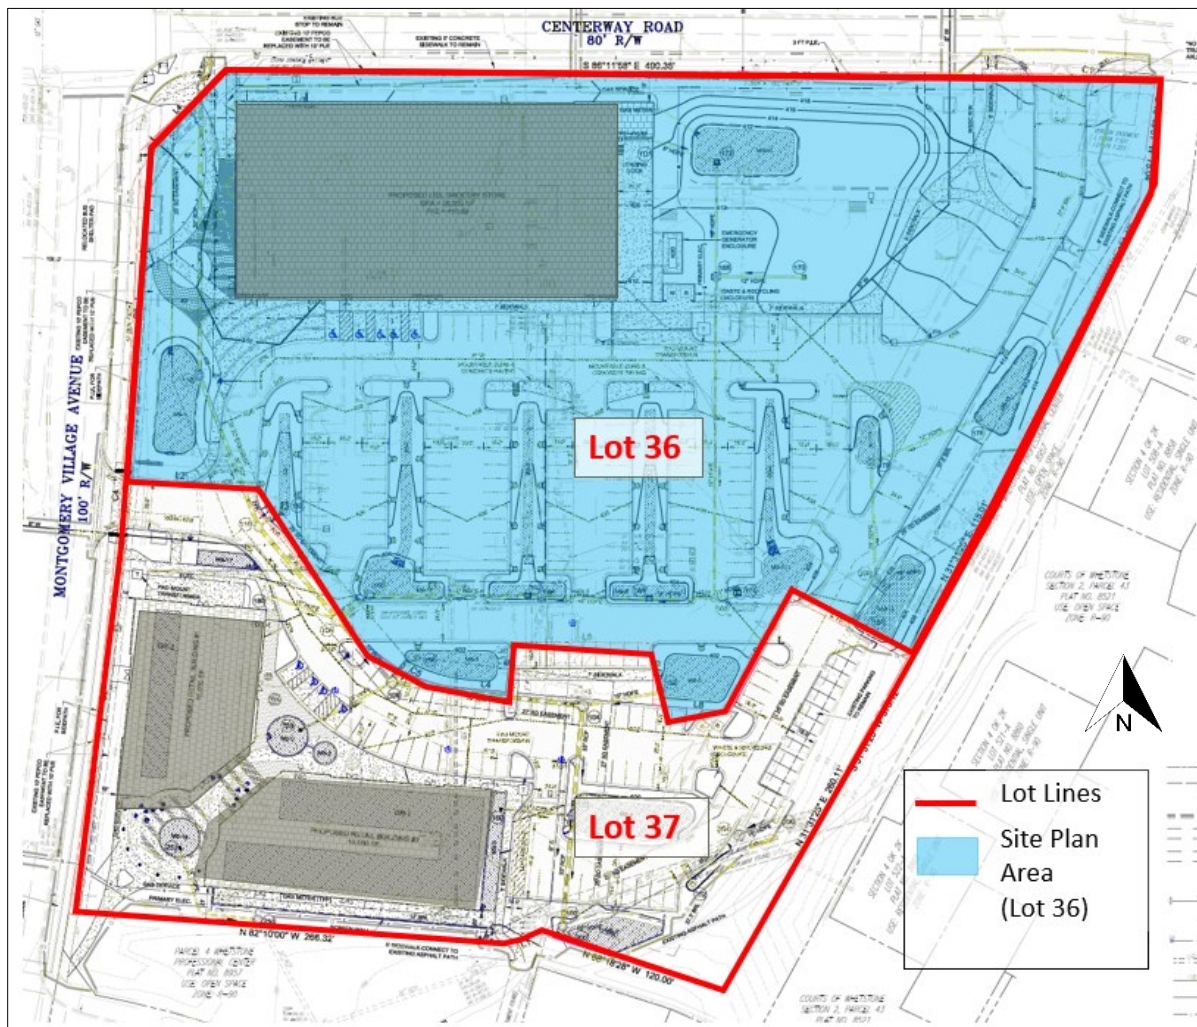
Preliminary Plan (Lots 36 and 37, 6.52 acres)
